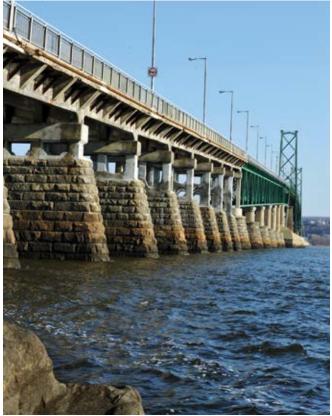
The rehabilitation of elevated bridge structures is a common example of an application where the shotcrete process can minimize the problems related to access
